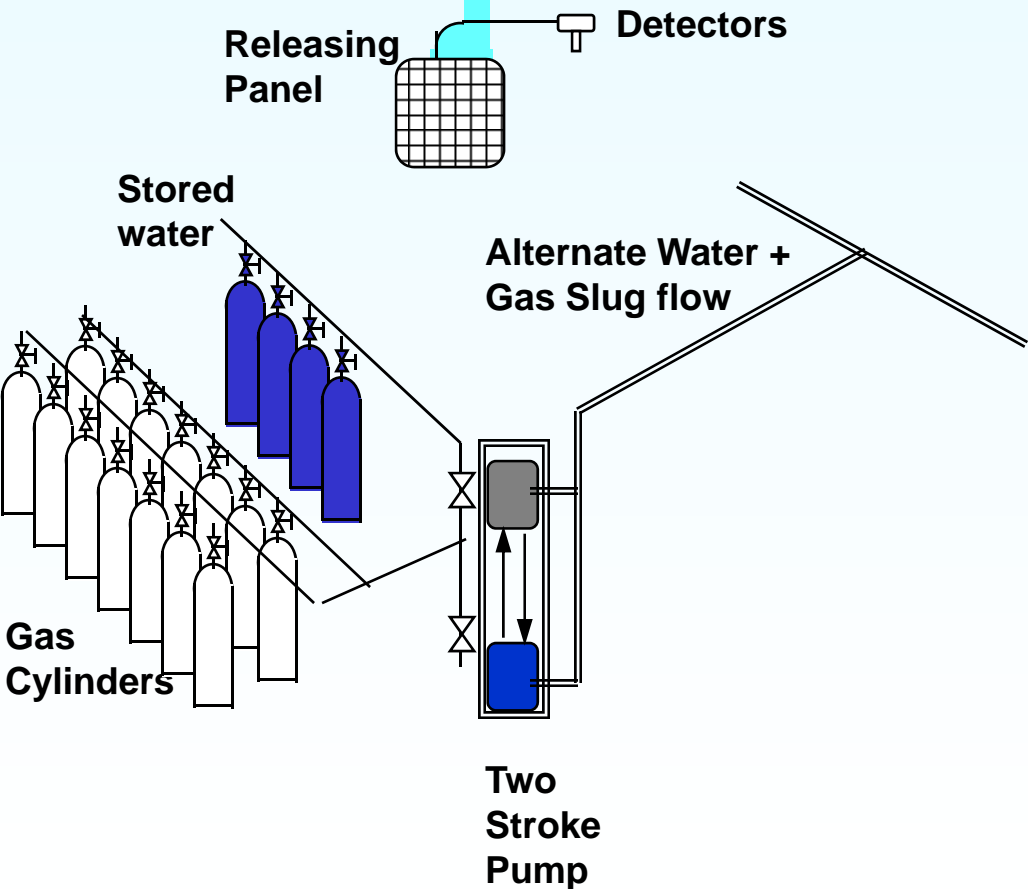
(h) Gas Pump Unit for Machinery Spaces and Gas Turbine Enclosures. [Typical]
